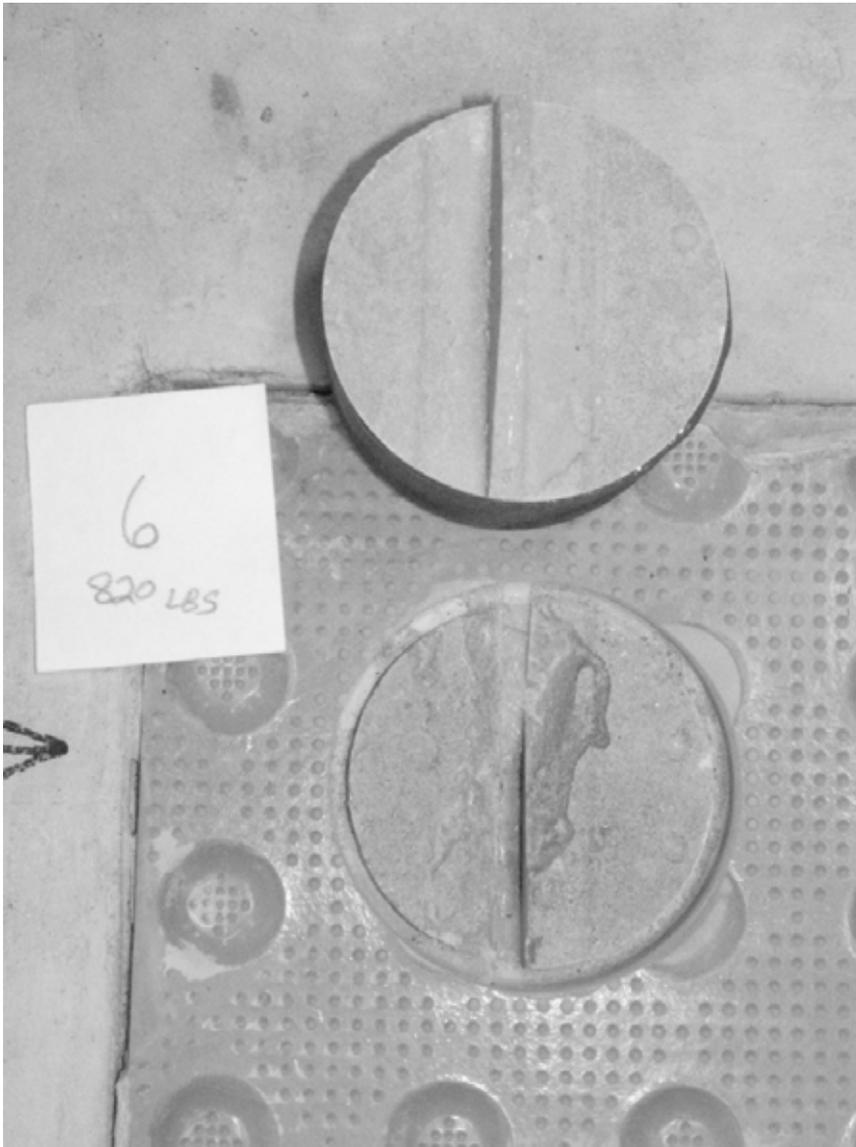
System bond test of cast-in-place polymer concrete system with discrete anchor.
